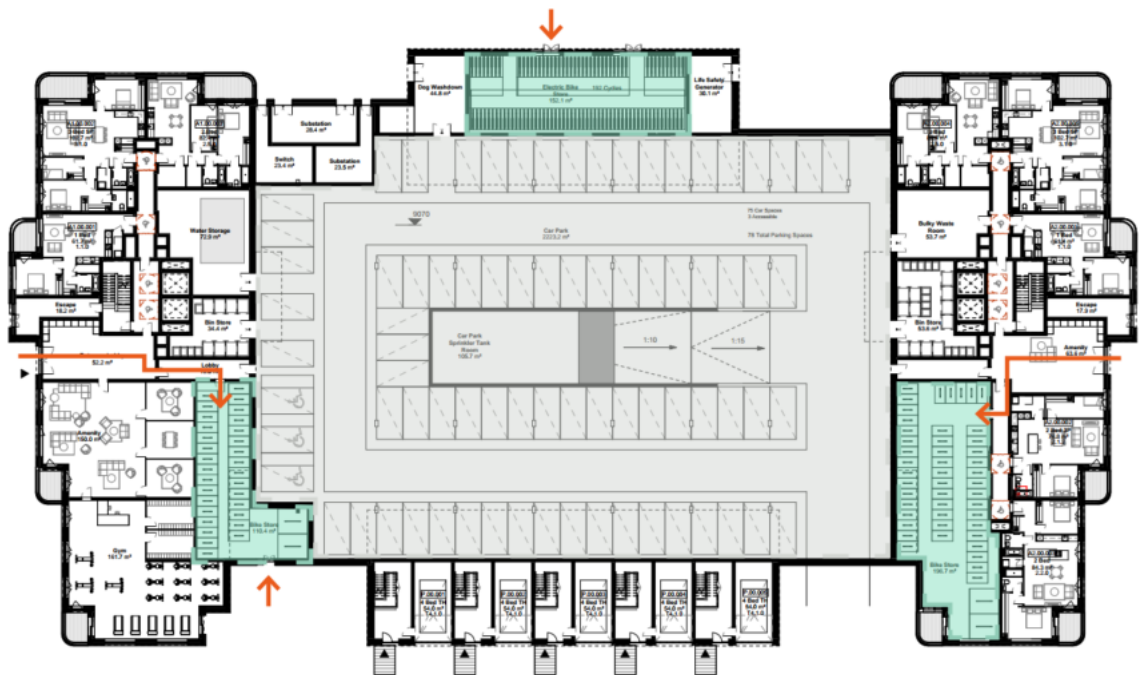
Proposed Ground Floor Cycle Parking Locations
